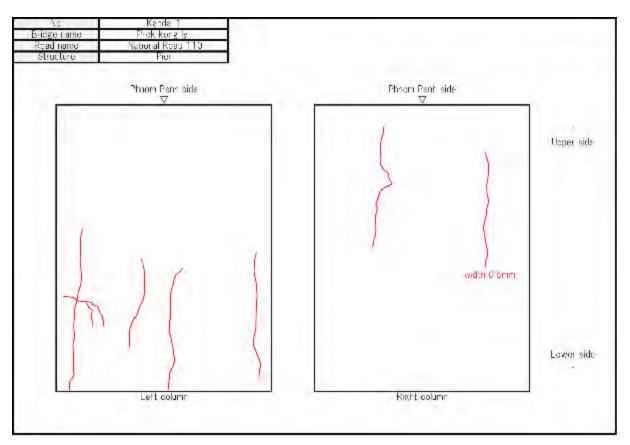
Inspection Sheet (Prek kong ly: Kandal. Bridge No. 1)
